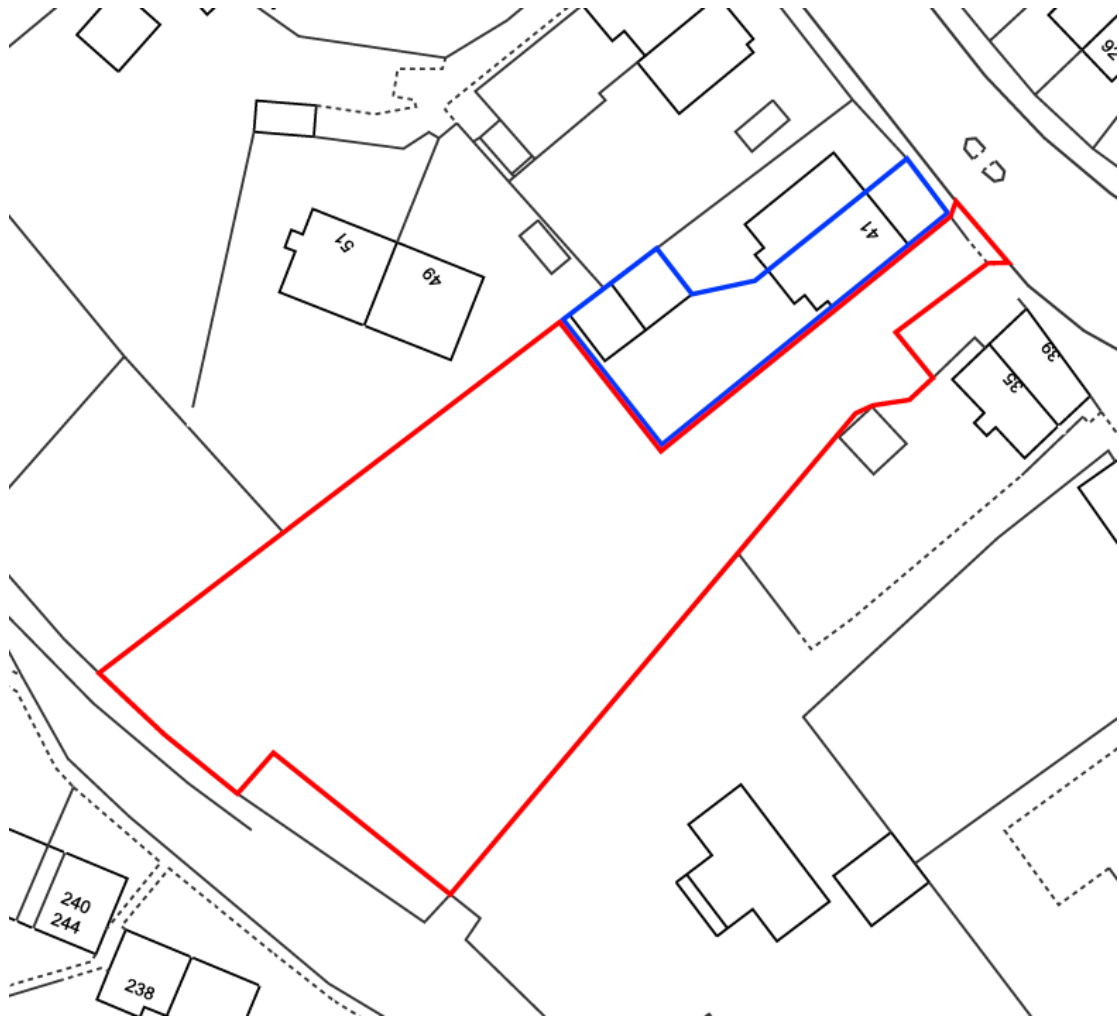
Site Plan – Application site in red, with No.41 and the Barn within the blue boundary.
